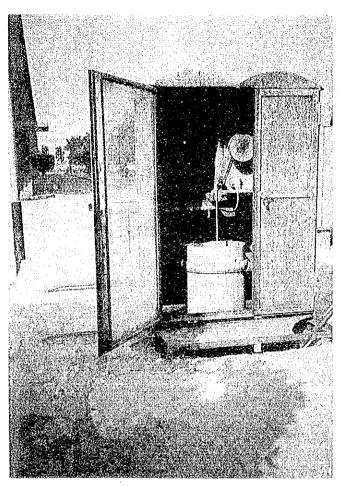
Filter basin high-voltage board (under the board, lead-in cable)
